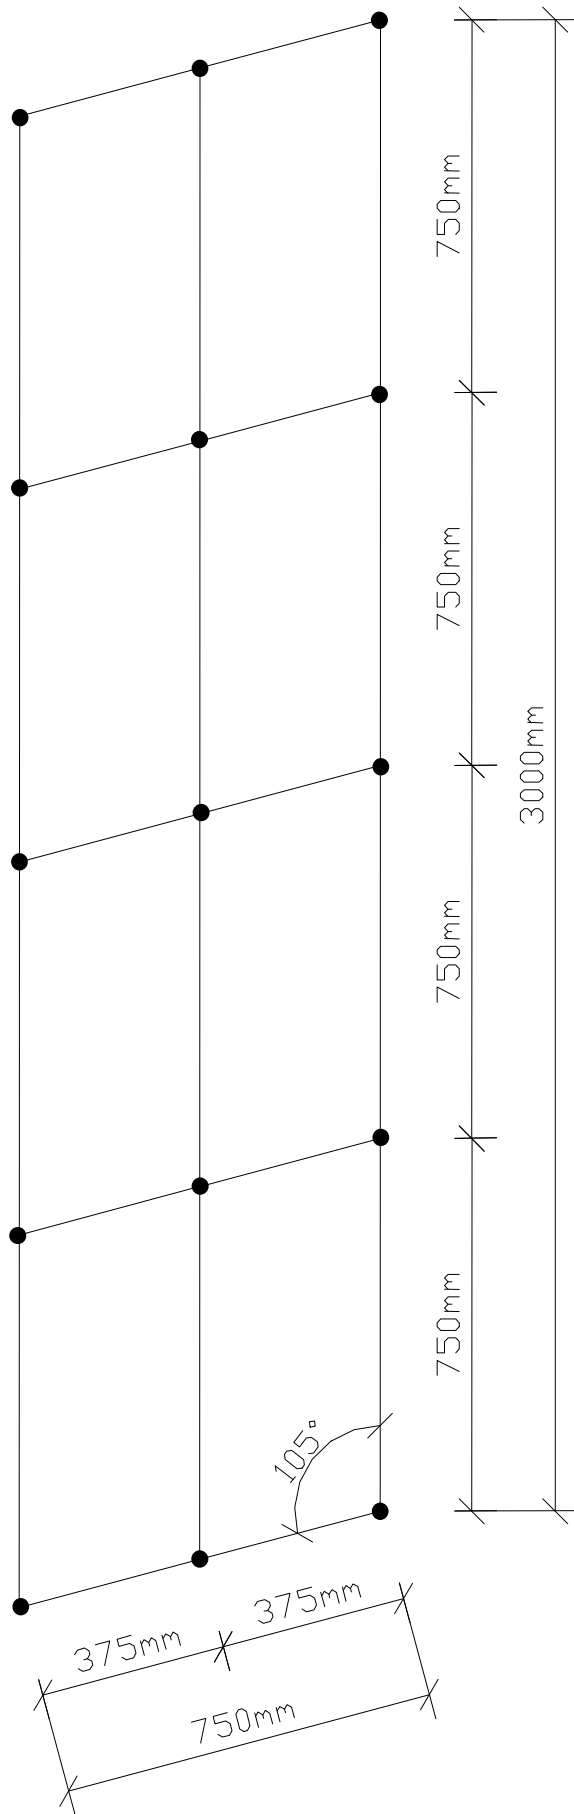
Dimensions of 4 bay single span skewed steel grid frame
